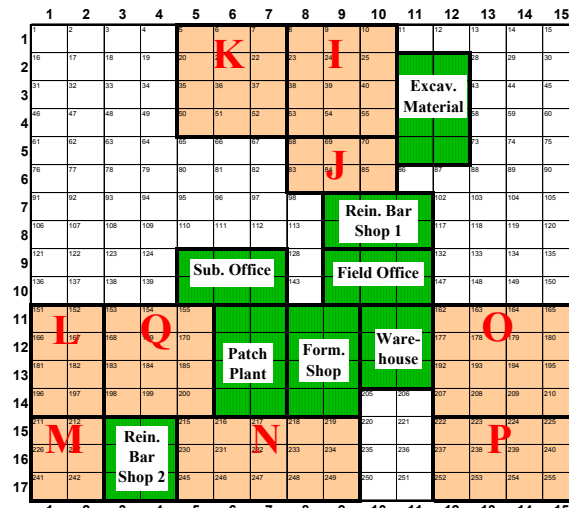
Final Site Layout Plan of the Application Example for Different Attempts
